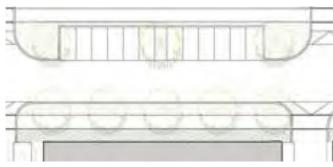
Typical Plan of Perpendicular Parking on Secondary Street
